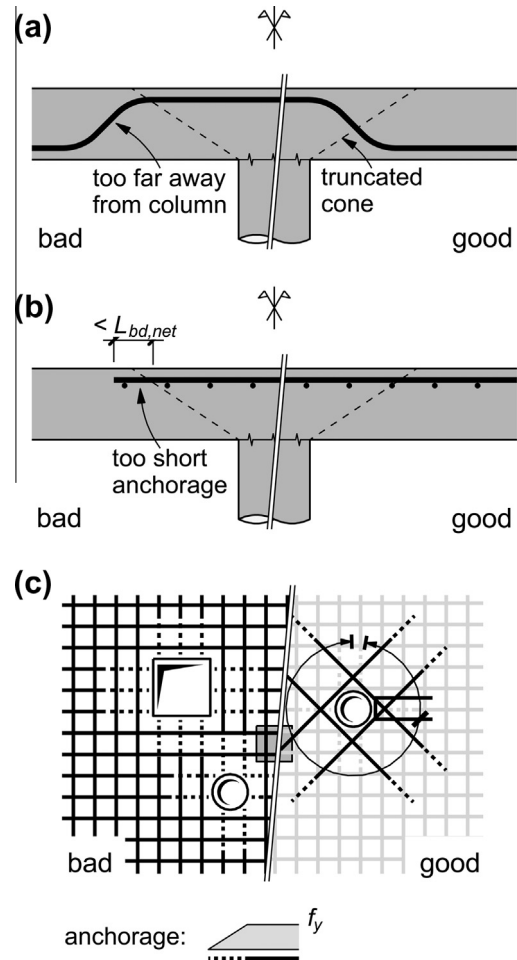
Detailing deficiencies: (a) shear reinforcement outside the truncated cone; (b) insufficient anchorage length of top reinforcement; and (c) cut rebars for openings.
